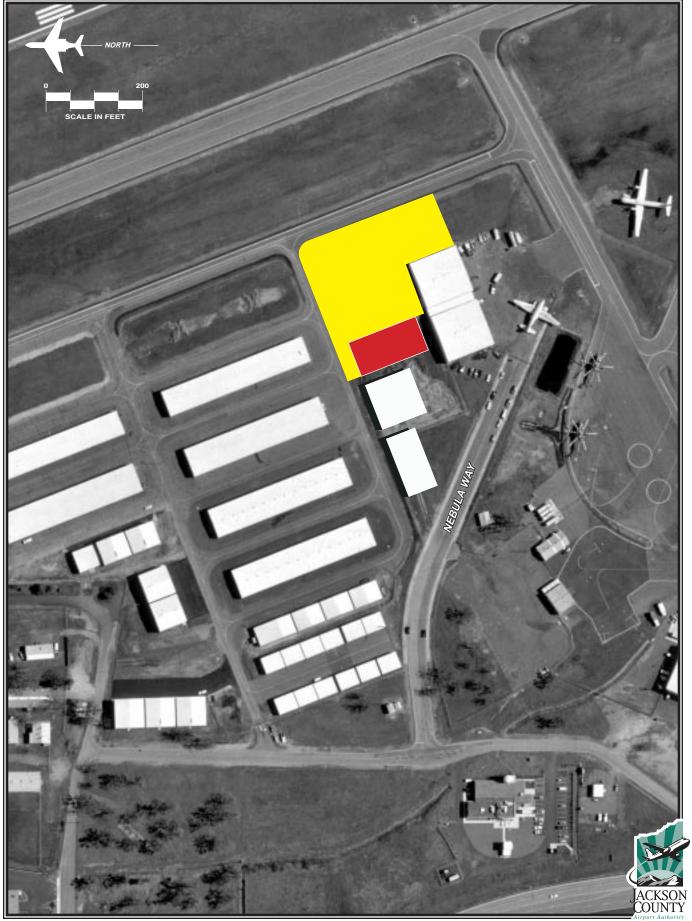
H PROPOSED HANGAR FACILITIES-NEBULA WAY 99MP08-4J-3/12/01
